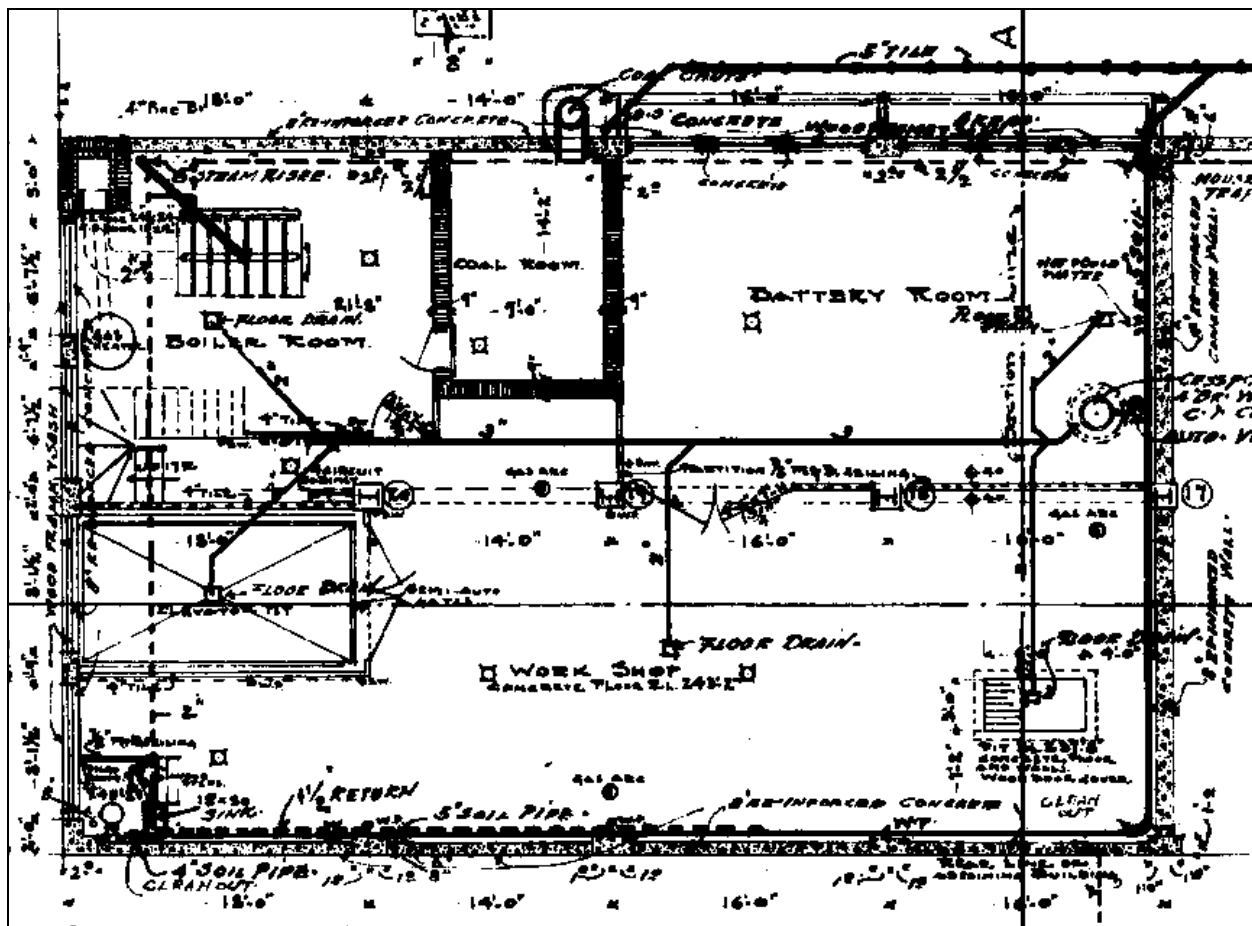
Detail of basement floor plan (excavated portion) from original drawings, 1911.
